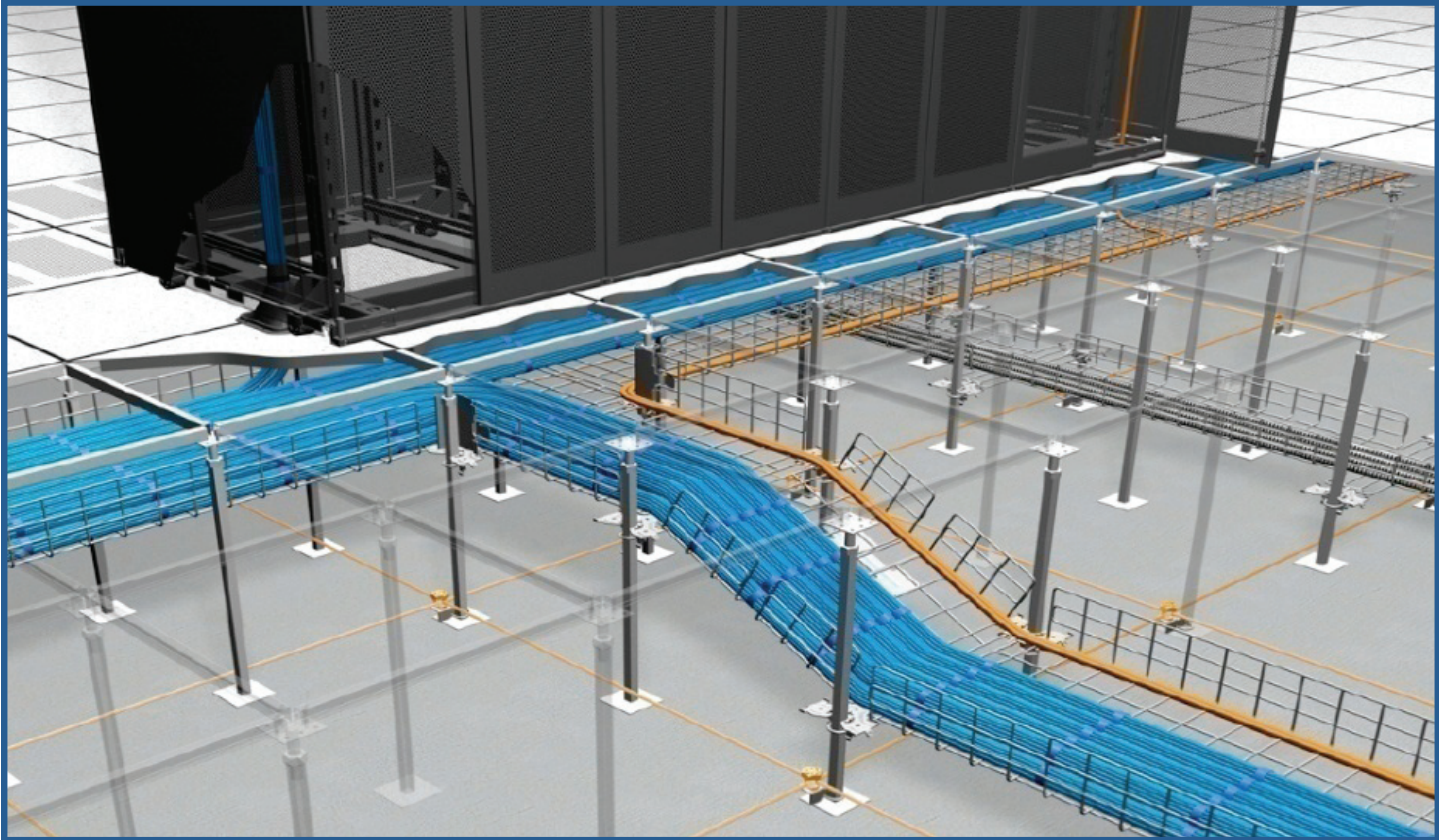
The PANDUIT® GridRunner™ Under-floor Cable Routing System supports high-density applications and provides integral bonding to the mesh common bond network (MCBN), improving user safety and equipment protection.
